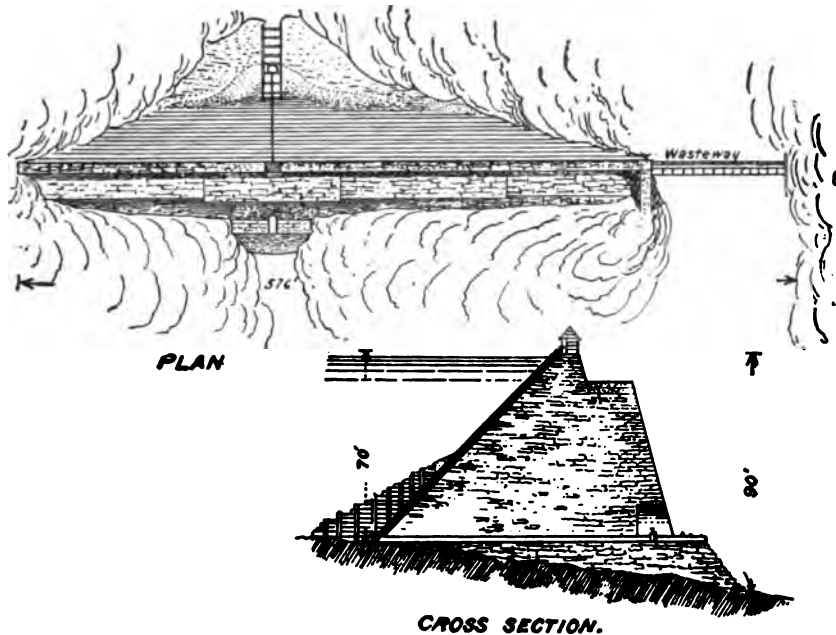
PLAN AND CROSS-SECTION OF THE FORDYCE ROCK-FILL DAM, CALIFORNIA.
